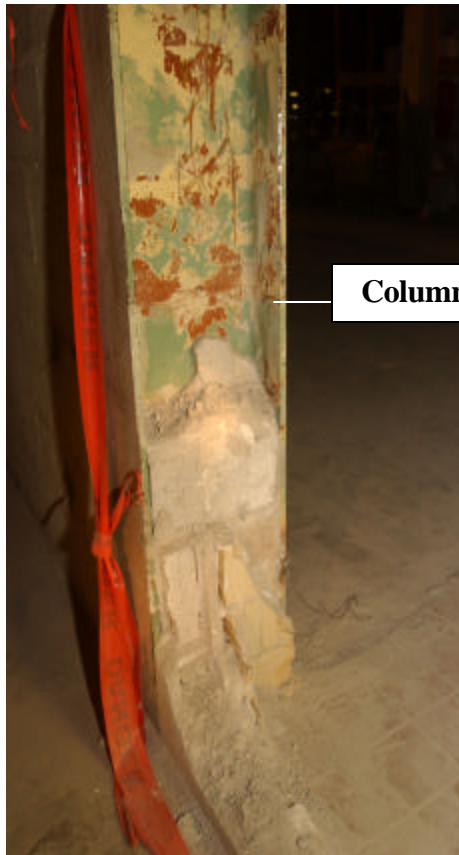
, 2-5, and 2-6 show a view of a column with block remaining in the lower portion of the column, a view of a column with block remaining in the column after wall demolition, and a view of the remaining east wall of the Control Room, respectively. The schematic shown in Figure 2-1 provides a plan view of the K-31 Control Room demolition area on the day of the accident. Under the hot work Radiological Work Permit (RWP), the workers were intermittently cutting steel along with performing block removal.
